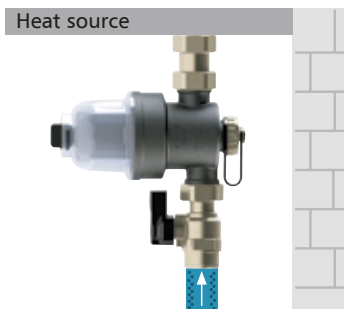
Installation of the ADS 110 separator on a vertical pipe
